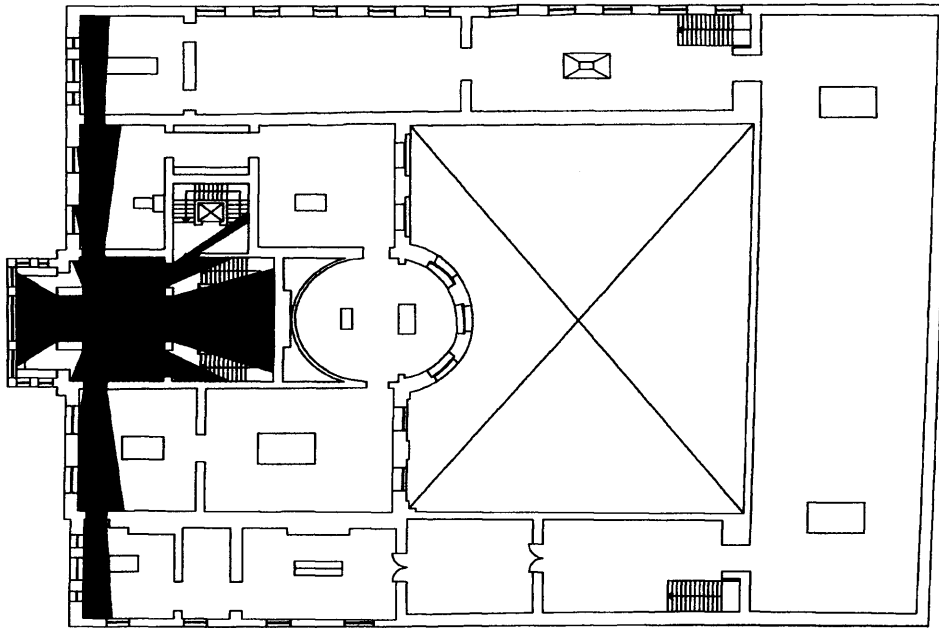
Wallace Collection, isovist from the top of the stairs.
